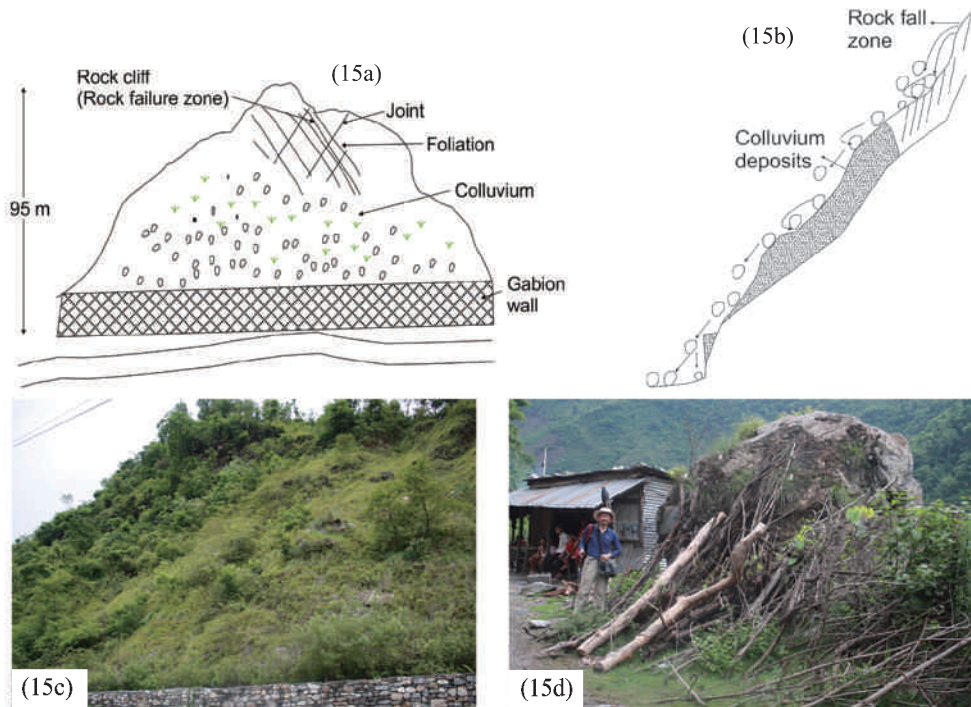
(a) Sketch showing the rock fall zone near Ghumaune of 2006, (b) Cross-section of the rock fall area, (c) Road section showing the steep cliff at Ghumaune, where rock failure occurred during the monsoon of 2006, (d) Large boulder of dolomite formed by the rock failure during the monsoon of 2006 lying on the road side.
